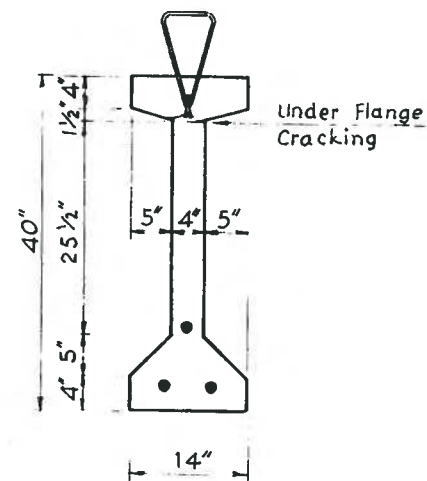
Typical underflange cracking which at times occurred in originally designed girder.
